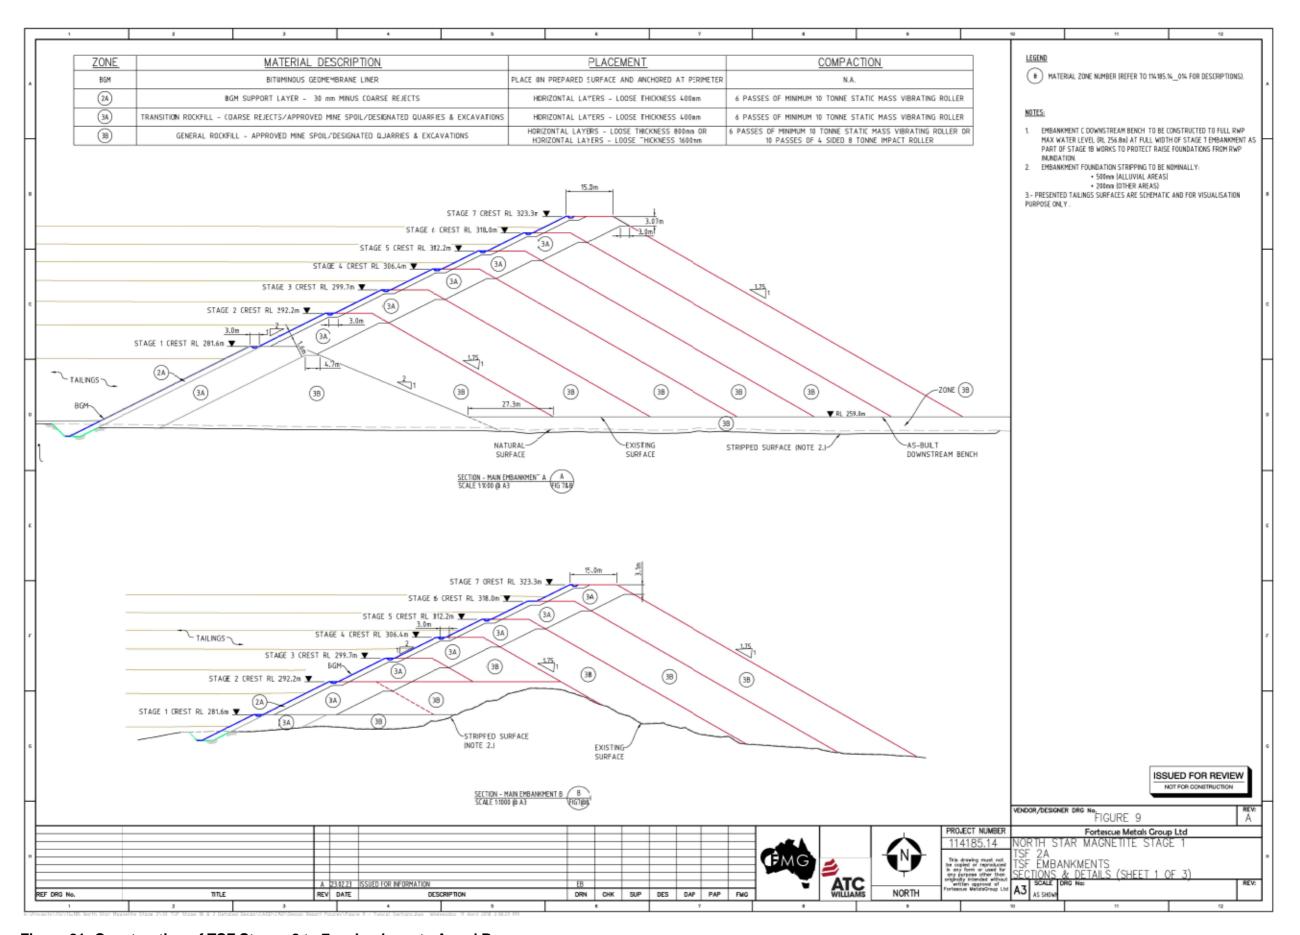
Construction of TSF Stages 2 to 7 embankments A and B
